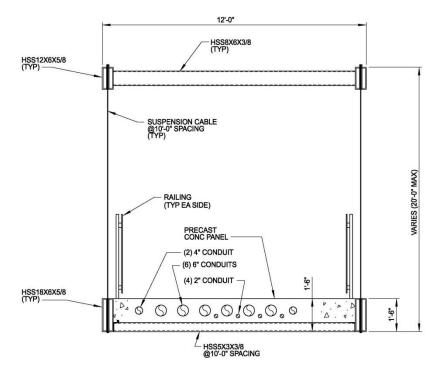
, Depiction of Conduits constructed in Pedestrian Bridge
